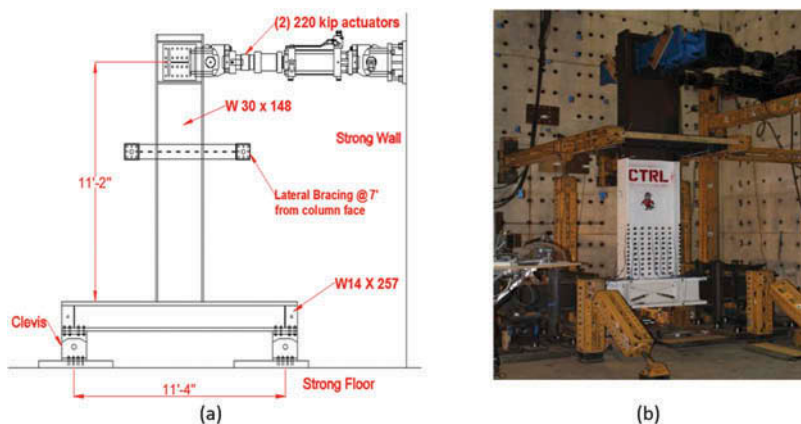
Test configuration for the beam-column steel connection: (a) schematic diagram, and (b) screen shot for the test [Schweizer, 2013].
